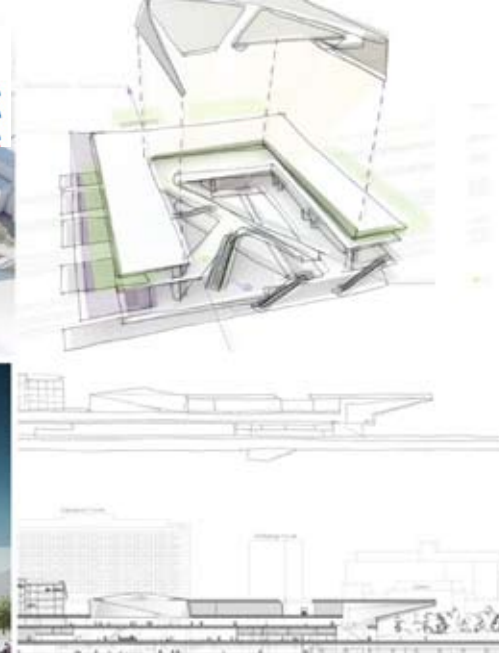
TAXI RANK INFORMATION PAVILION PLAN
